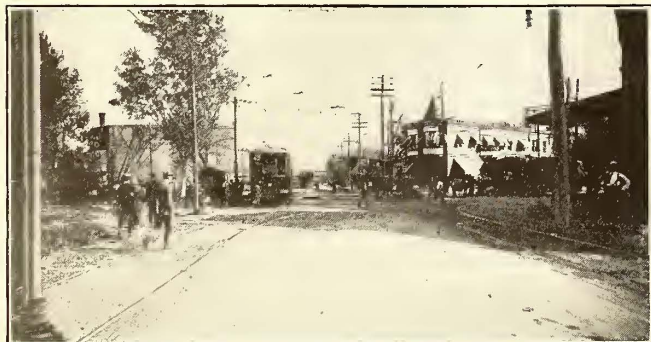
EASTWICK AVENUE AND ISLAND ROAD—SUBSTATION STRUCTURE IN THE RIGHT BACKGROUND
